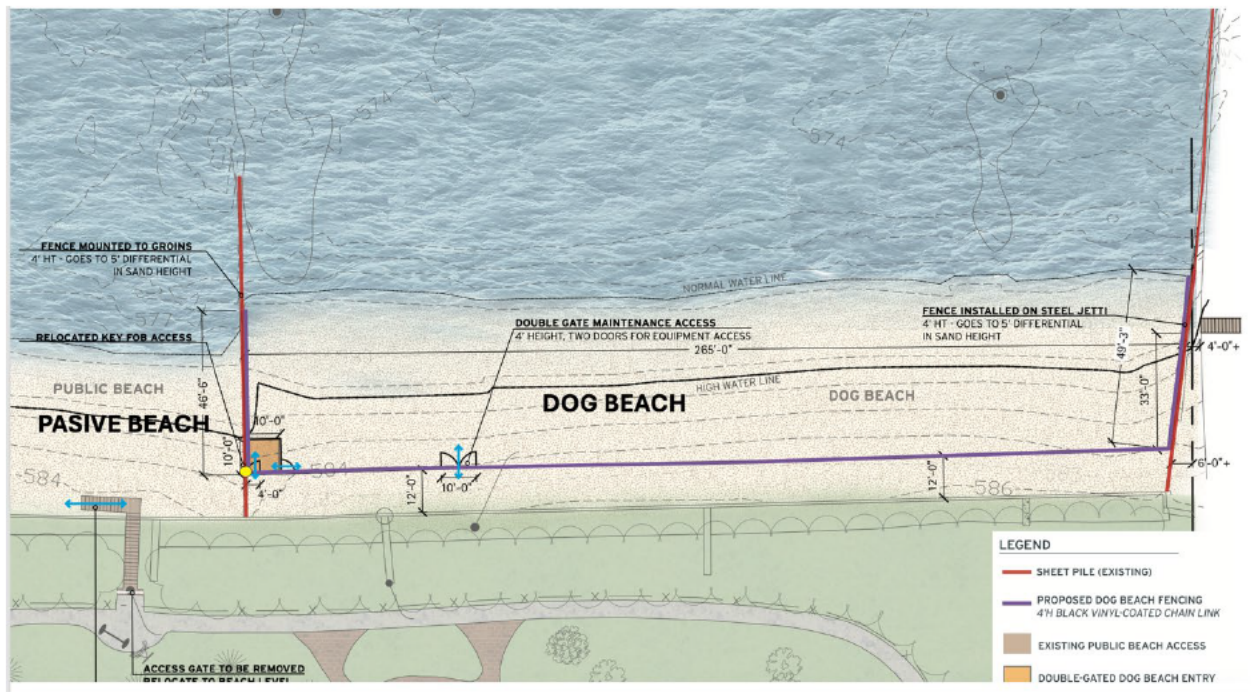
Case No. 25-28-SU Revised Dog Fence Design (Revised Plan)
